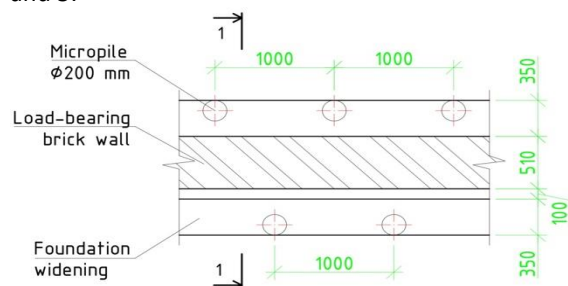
Layout of micropiles under the strip foundation (plan view)
